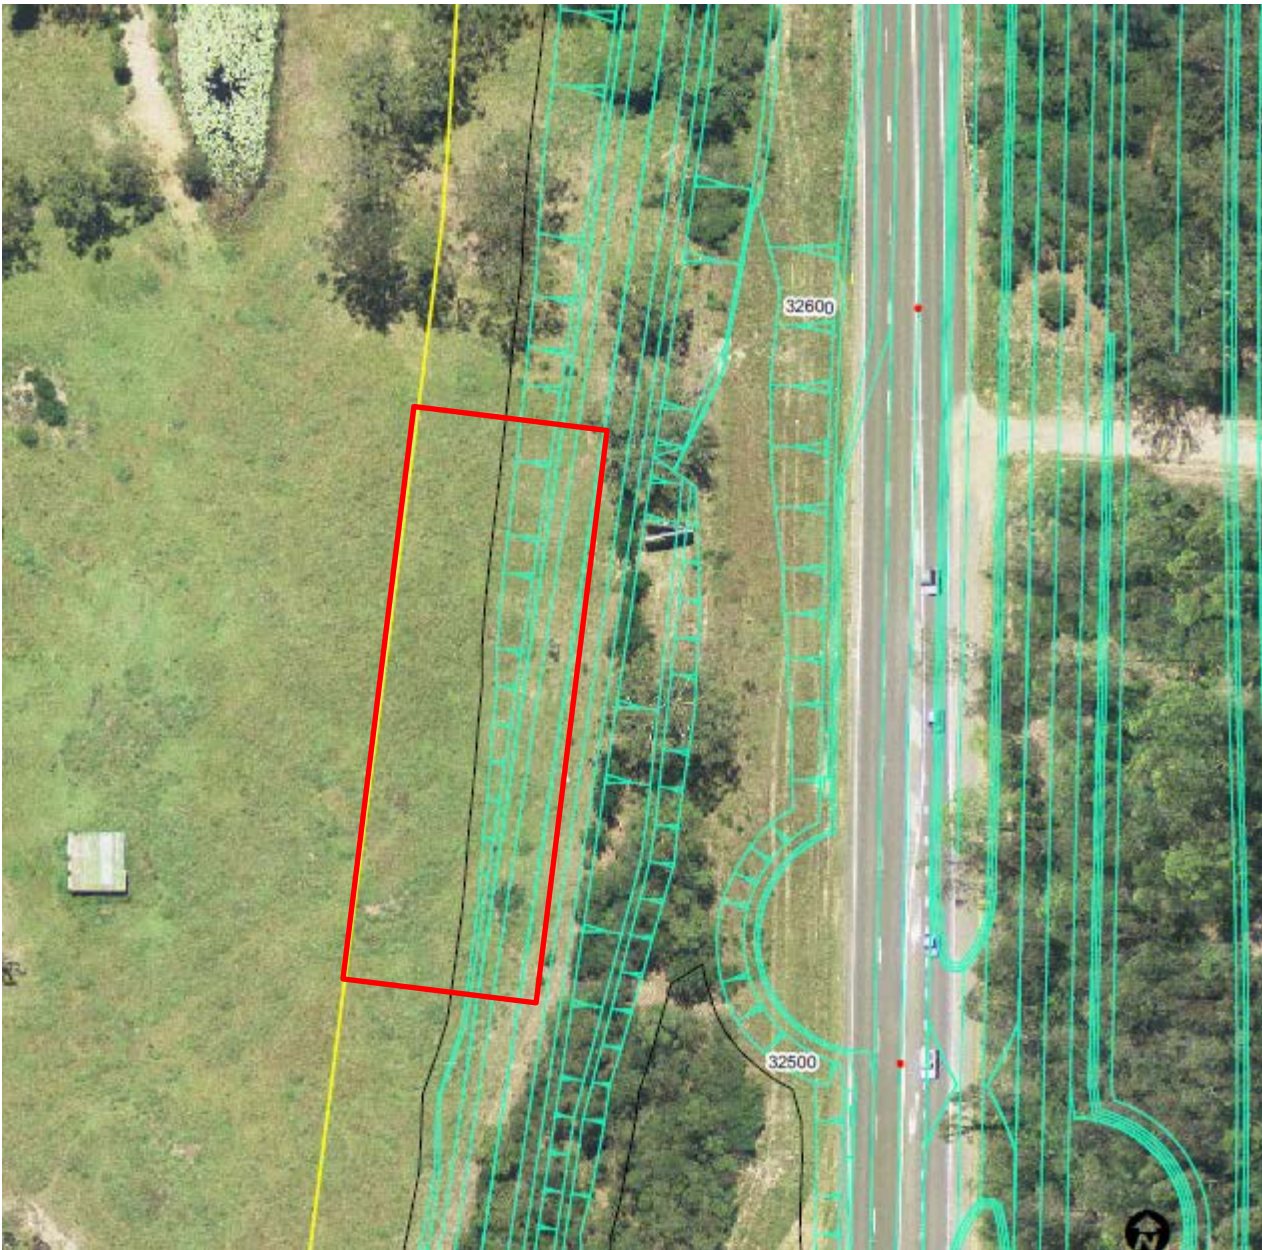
Plan showing the extent of works proposed within the subject site (which is outlined in RED) as part of the K2K Project (Source: RMS 2014)
